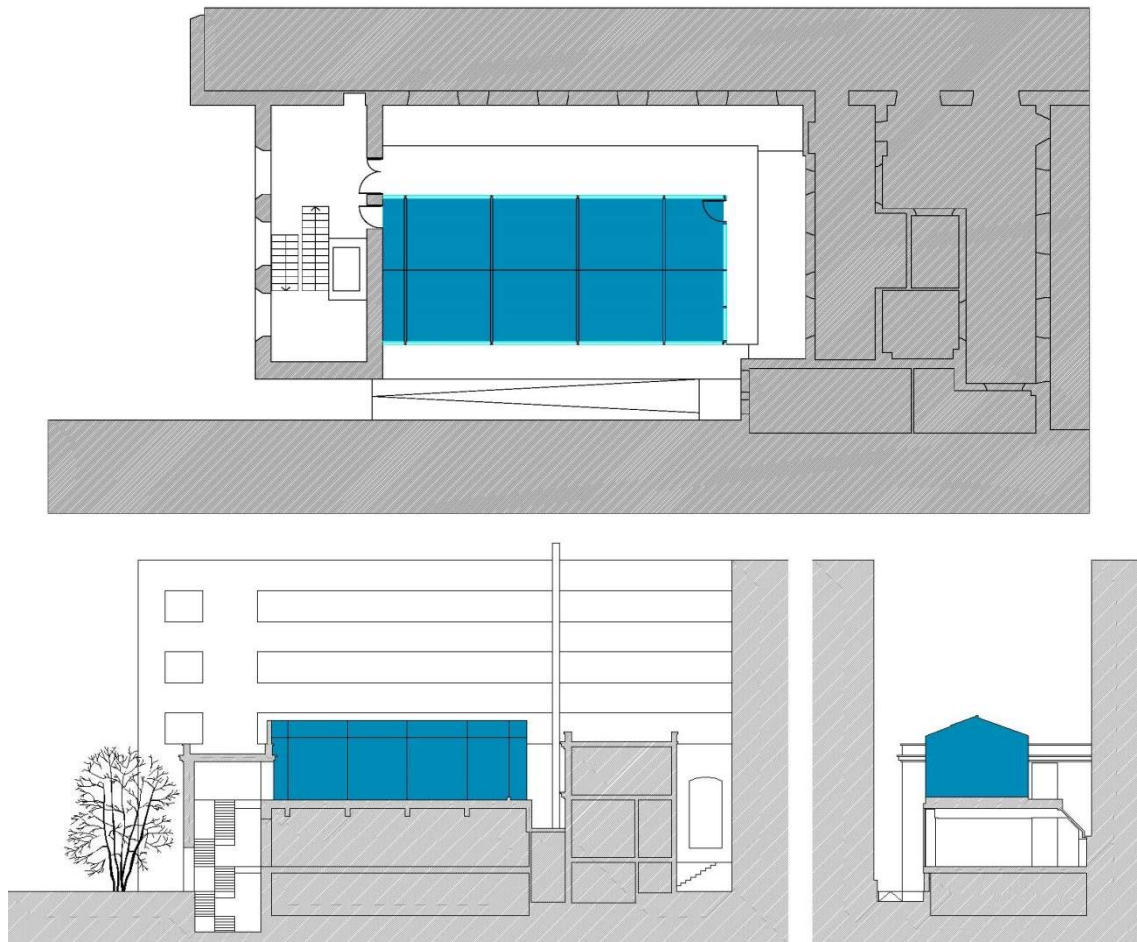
Atlantic Copper classroom. a) Floor plan; b) East and North elevations.
